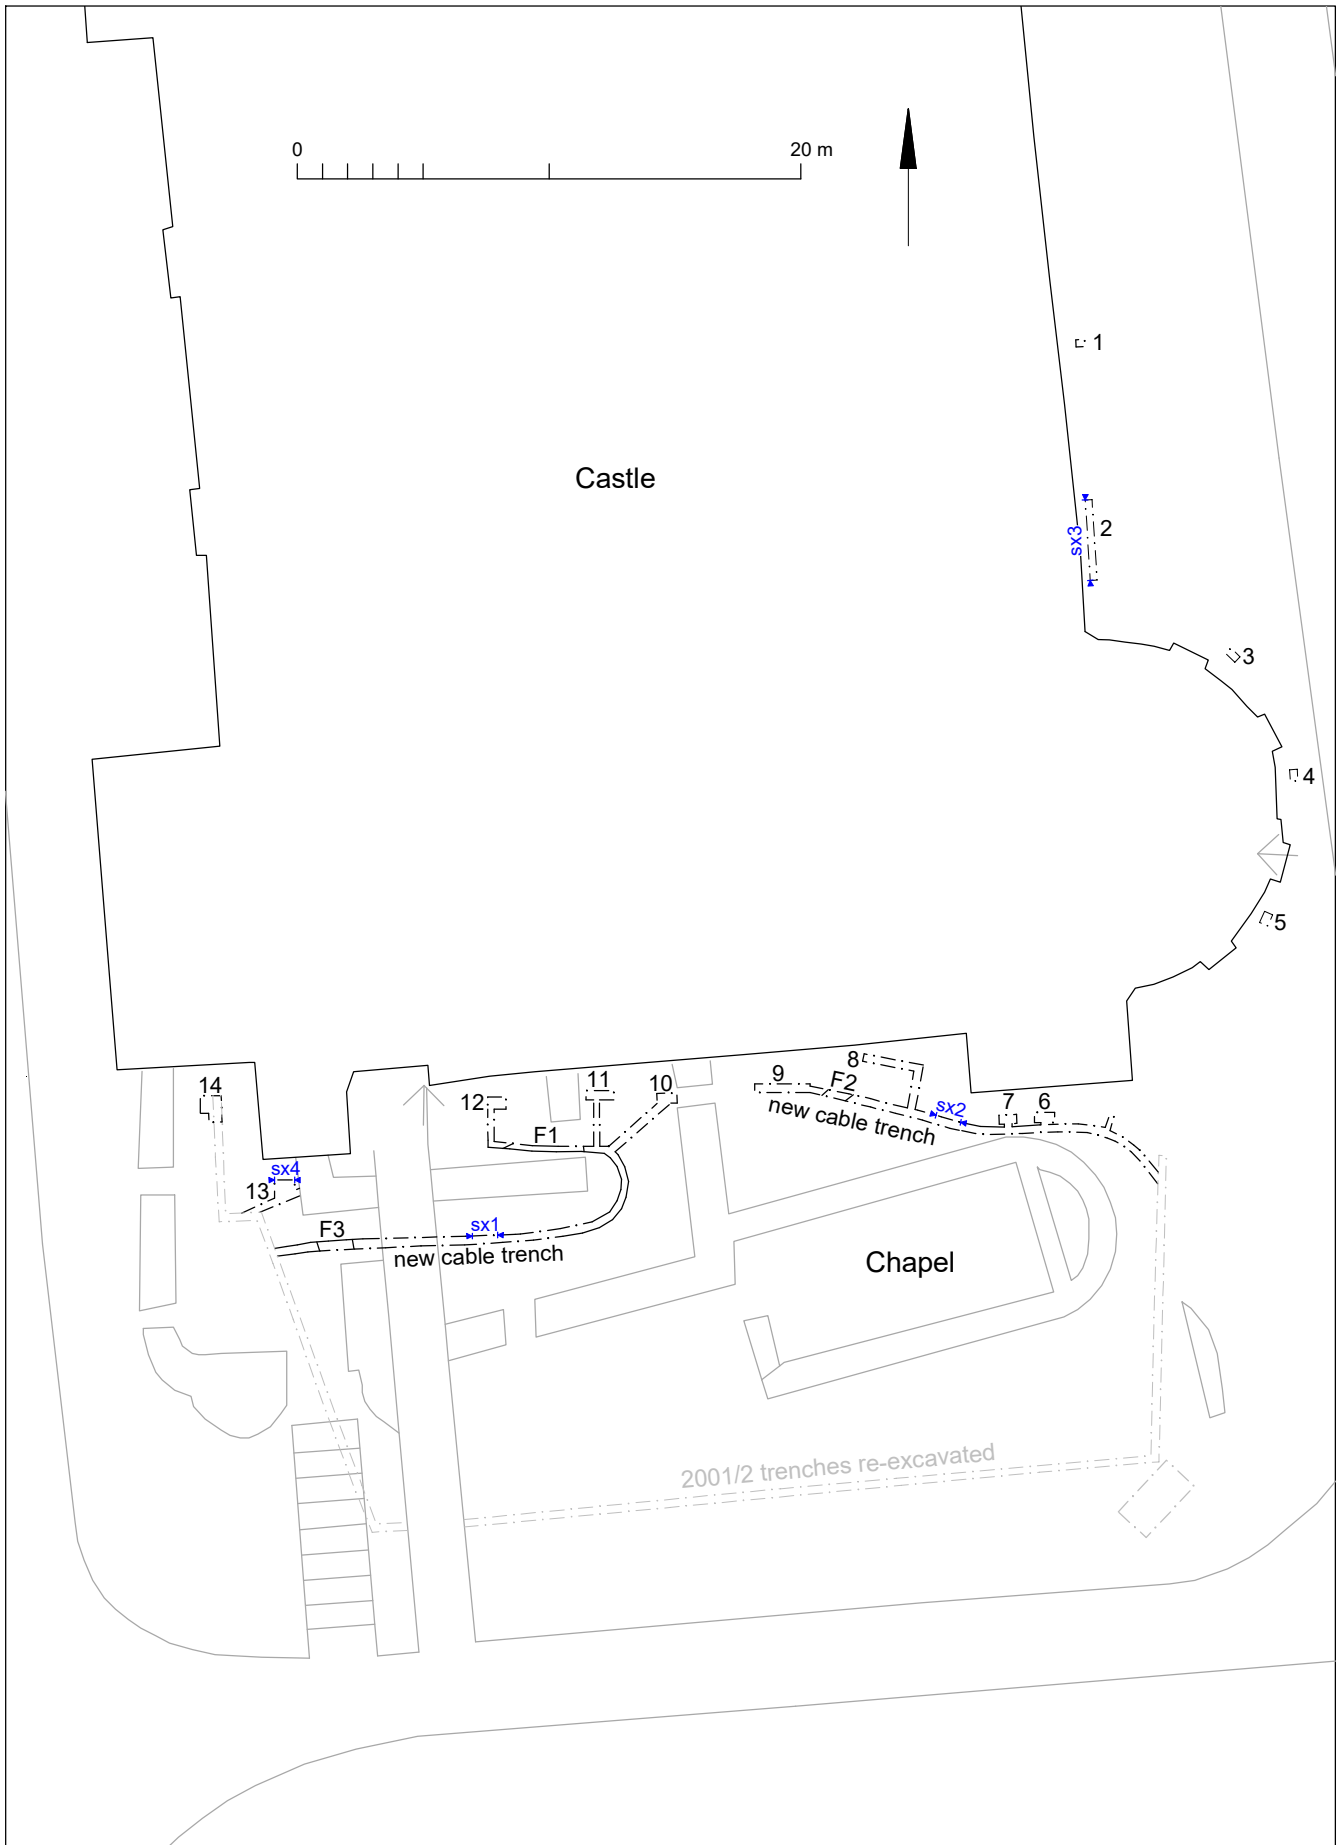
Results showing locations of the new cable trenches and light boxes 1-14.
